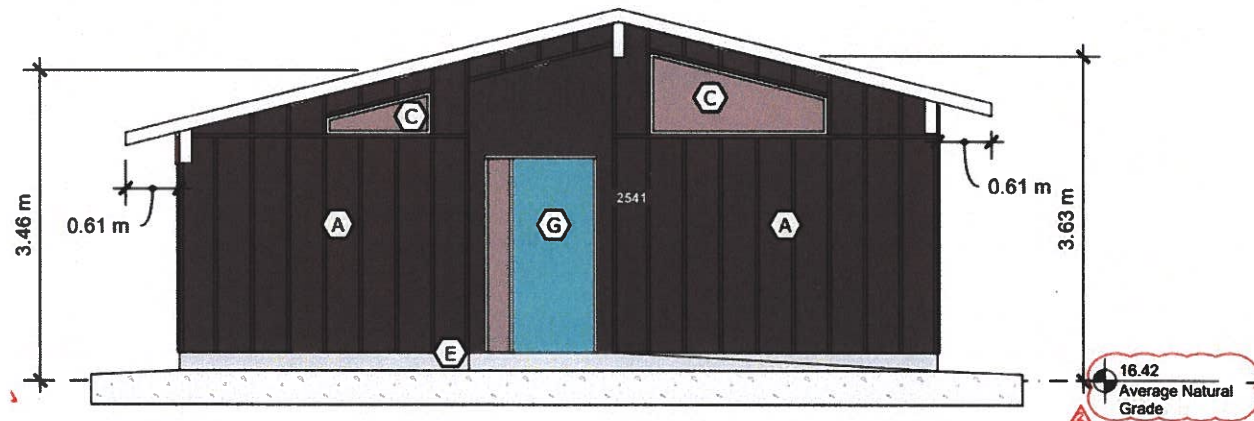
East Elevation (from plans by House Behind the Hedge Design Build)
